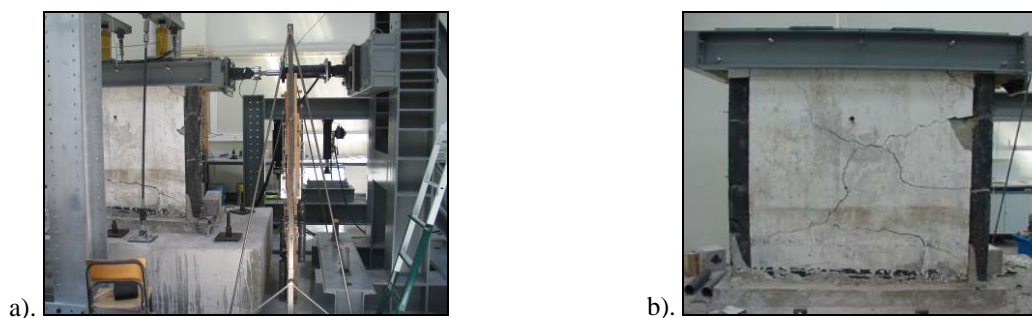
Specimen visualization: a) under test; b) final cracking pattern
